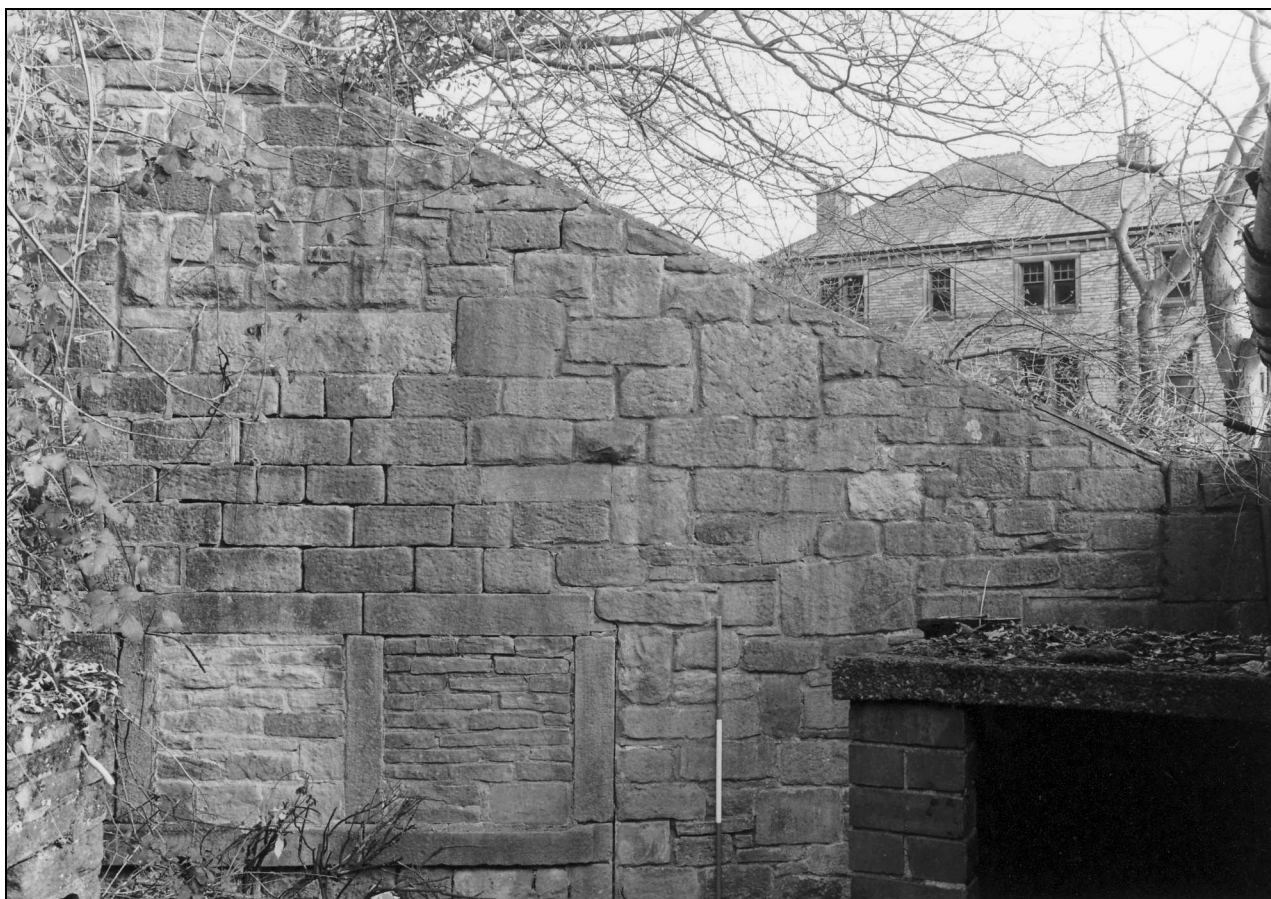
Retaining wall on north side of rear yard, with blocked windows of former building (film 3, film 2)
